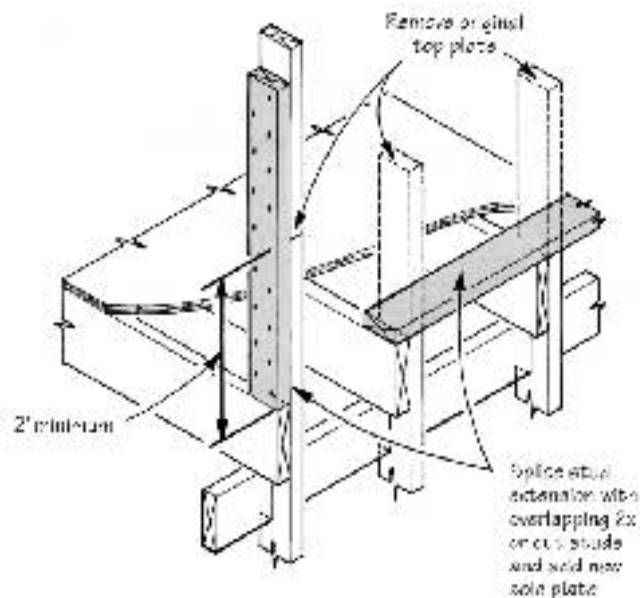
When adding a shed dormer above balloon-framed half-walls, don't build the wall extension directly on top of the balloon wall top plate. Instead, either remove the top plate and carefully splice on stud extensions or cut the balloon studs flush and build a new full-height stud wall.
